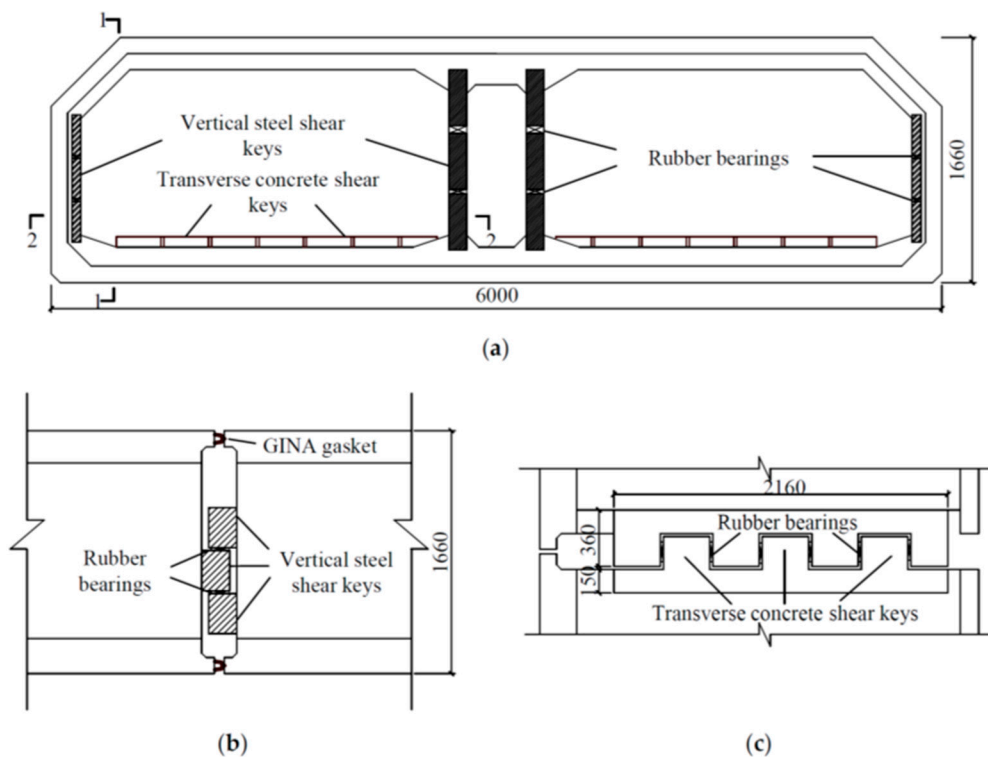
Immersion joint model (units: mm). (a) Cross-section of the joint; (b) 1-1 cross-section; (c) 2-2 cross-section (reproduced with permission from Yuan Y et al. [34]).
